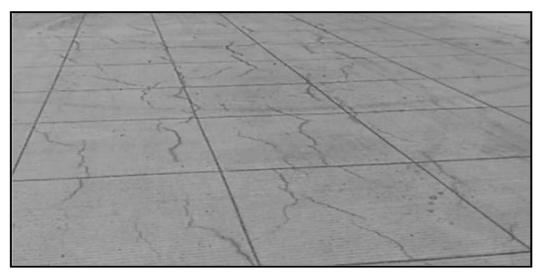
Plastic shrinkage cracks in CC pavement
